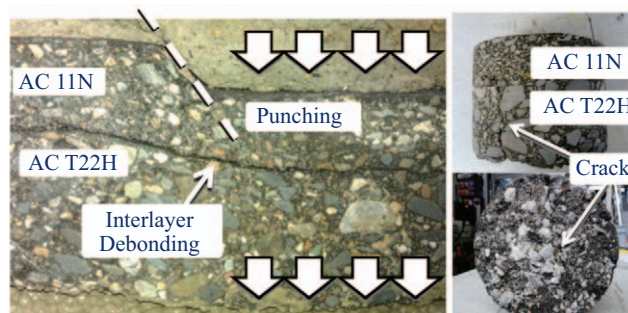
View of a slab showing the deformation of the bituminous layers due to punching into the subbase and interlayer debonding. On the right, a core showing cracking on the bottom.
